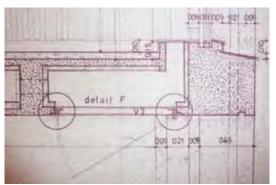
Detail section BB (Antwerp: deSingel).
